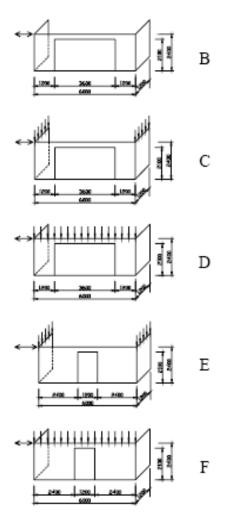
Configurations of shear walls tested during Forintek/Tongji project
